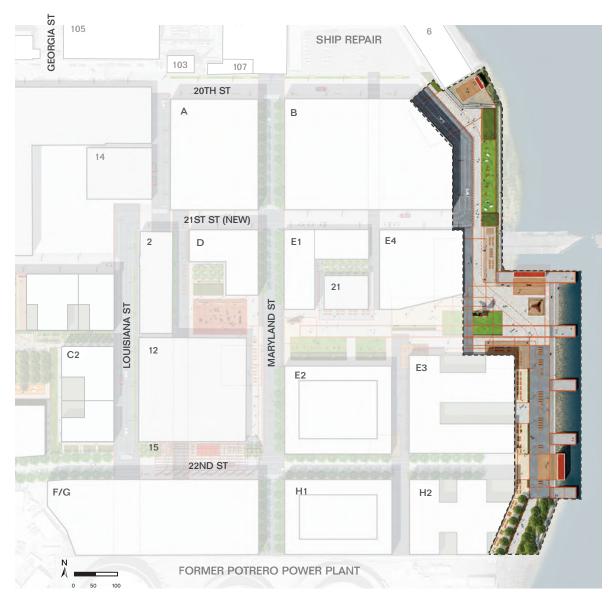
Illustrative Pier 70 Shoreline Plan
